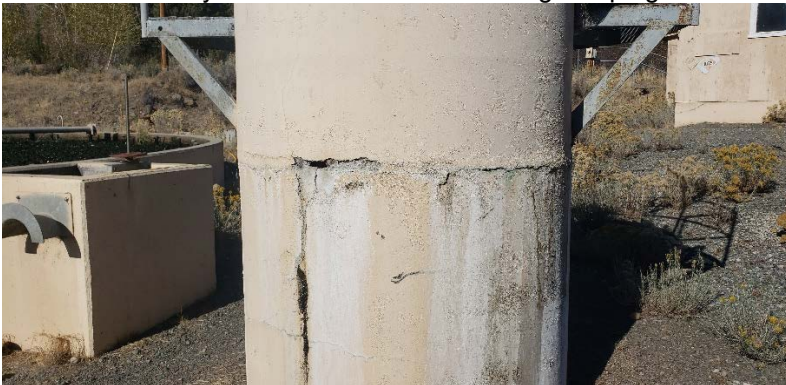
Trickling Filter flow splitting structure – concrete cracking/weeping
